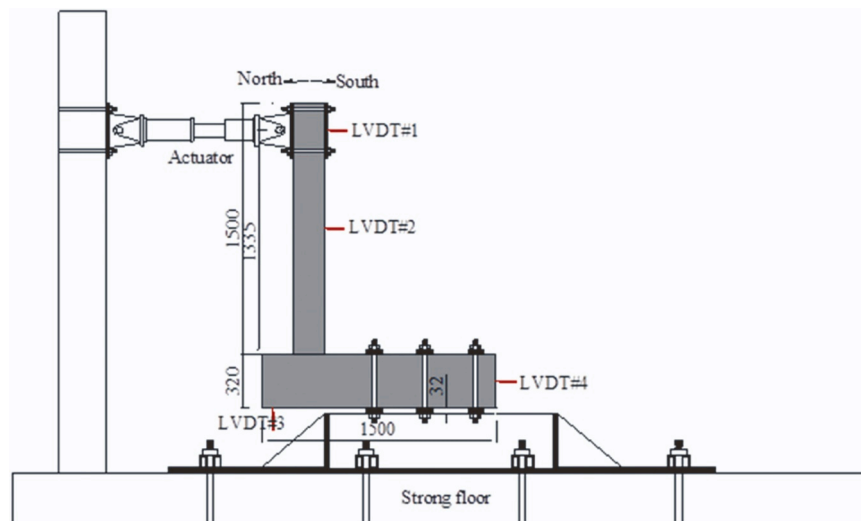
LVDT locations and test setup (All dimensions in mm).
